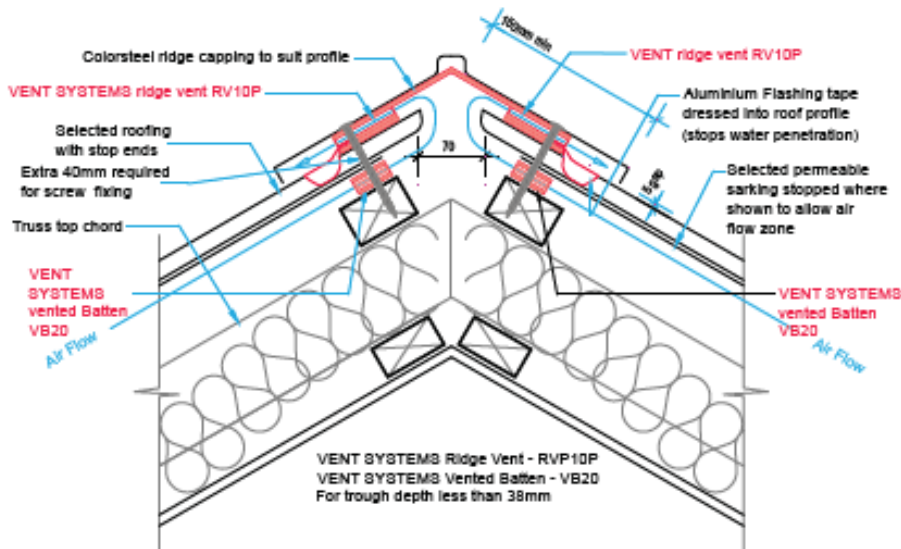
Fig D: Cathedral Roof Detail - Sarking above the roofing batten
